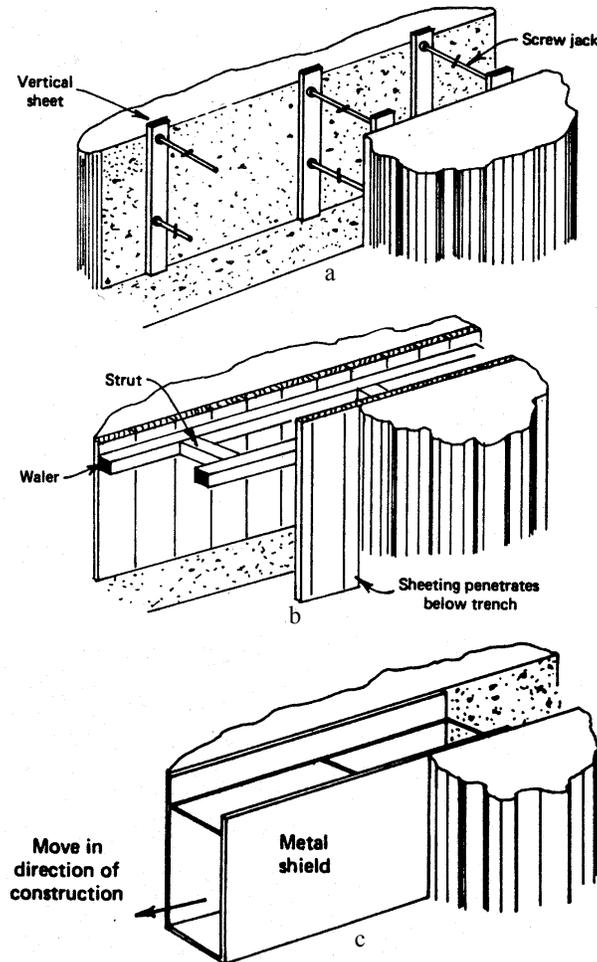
Bracing for shallow trenches. From top to bottom: a) intermittent sheeting and bracing, b) continuous sheeting and bracing, and c) trench shielding
